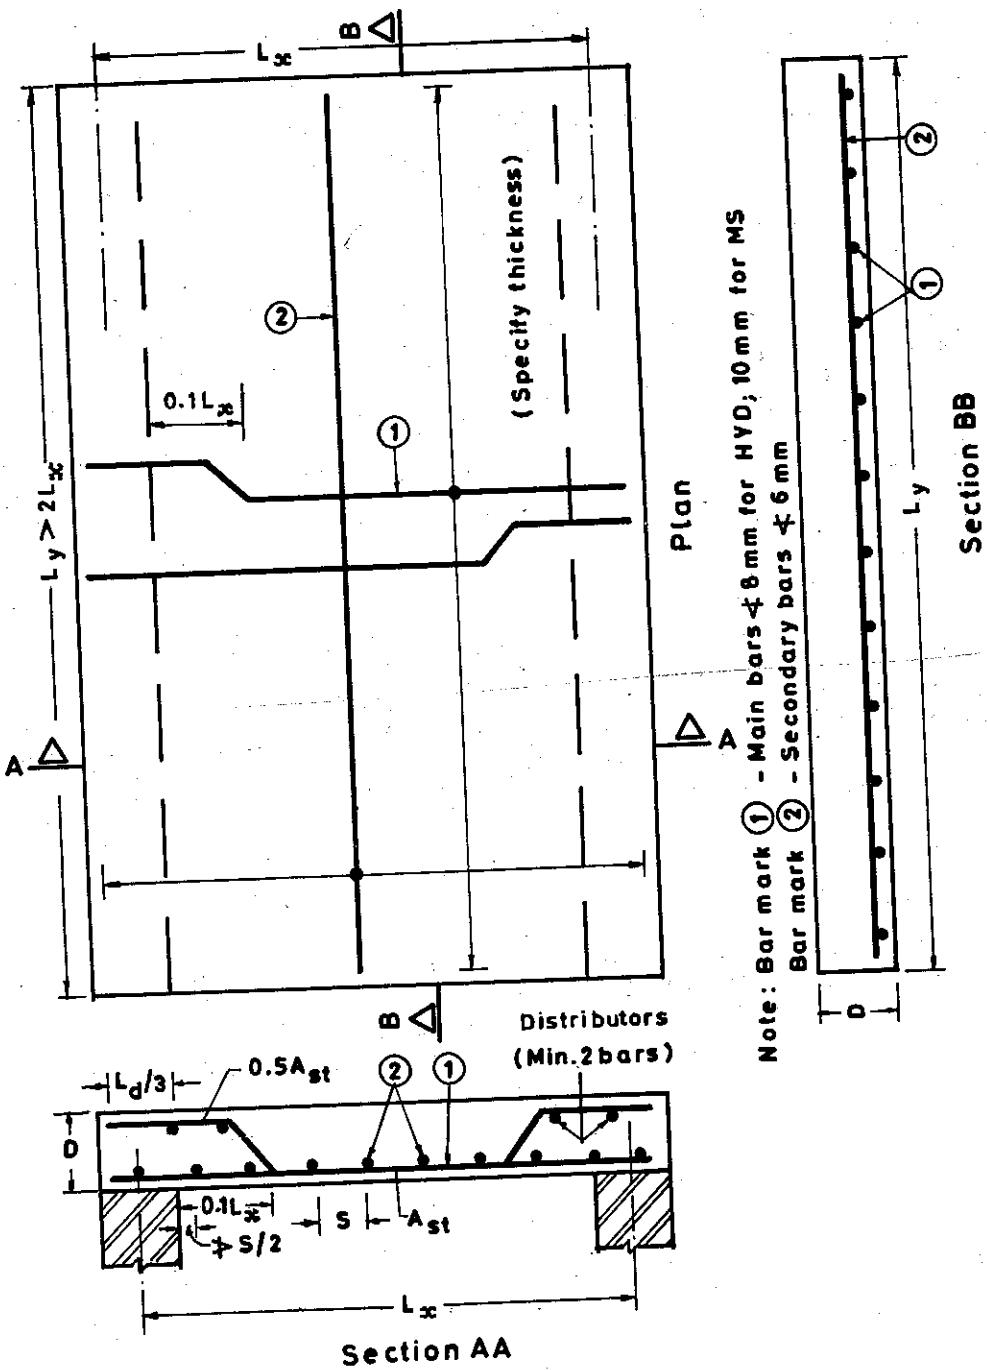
Layout of steel in one-way simply supported slabs with UDL.
